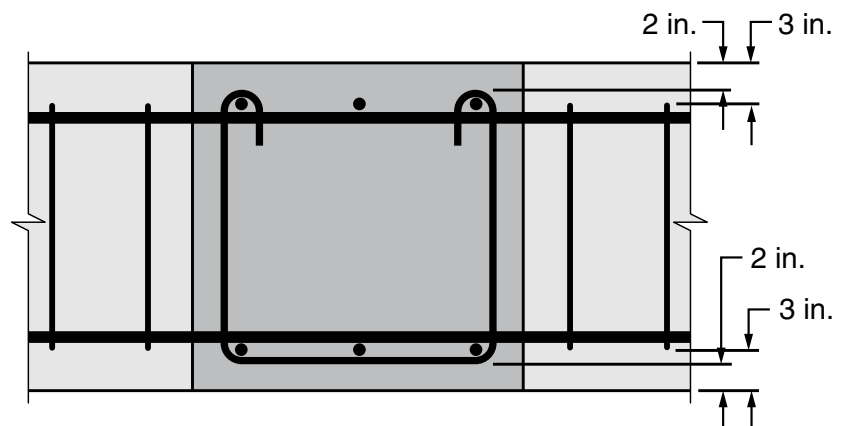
The designer must establish the layering of reinforcing at intersecting beams. The addition of required cover values will add clarity to the construction documents.
